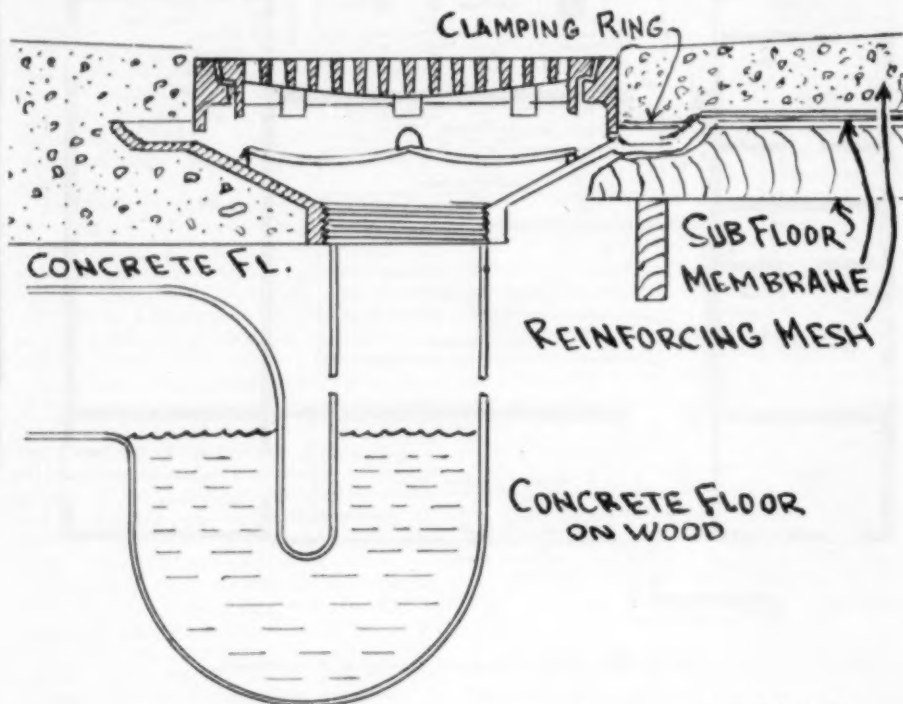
Typical floor drain, showing actual size of detail drawings and scale used.
